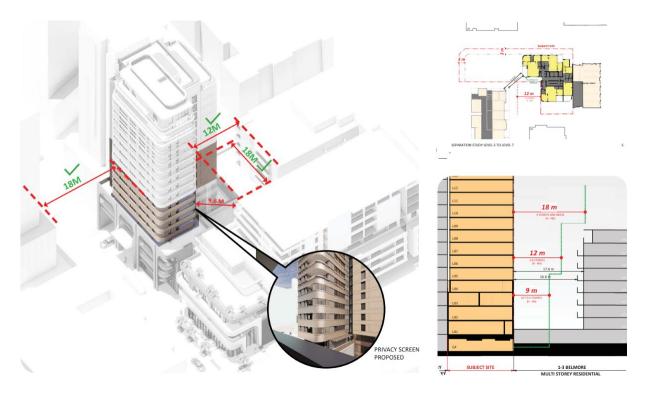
ADG Building Separation Diagram 2 (Source: PTW)
